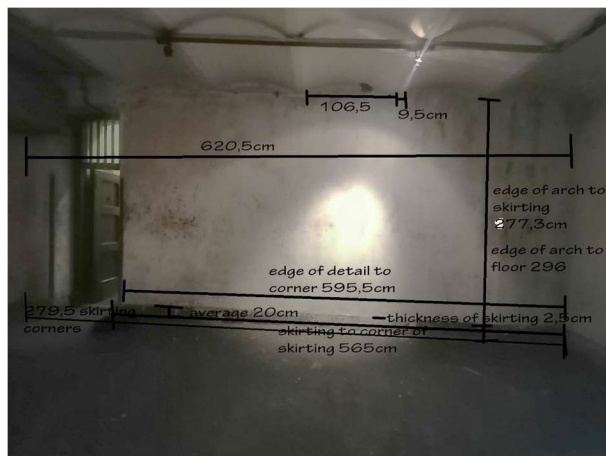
In-situ digital photograph with notes of East wall. Photograph by author.
